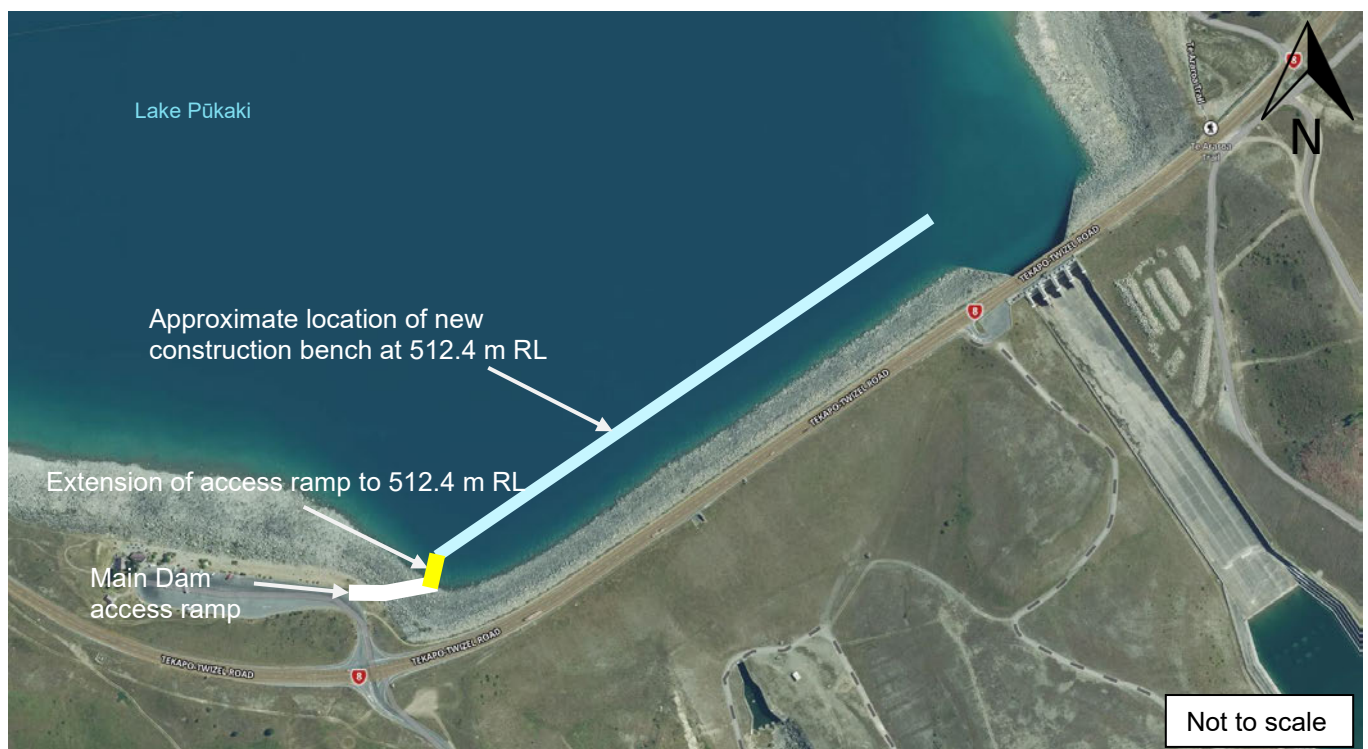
Site plan (Main Dam) and indicative 512.4 m RL construction bench
